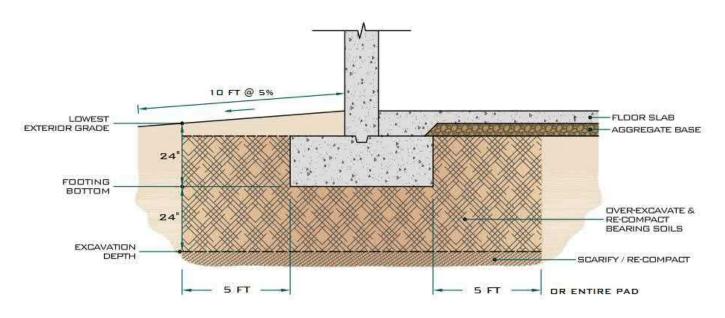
Foundation Detail – Bearing on Engineered Fill
